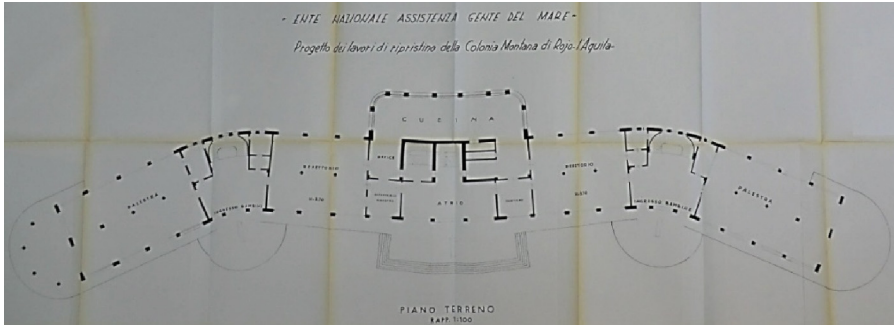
Colony IX Maggio: plan of the ground floor of the building (Archive of Ispettorato Generale del Ministero delle Finanze, ENAGM)
